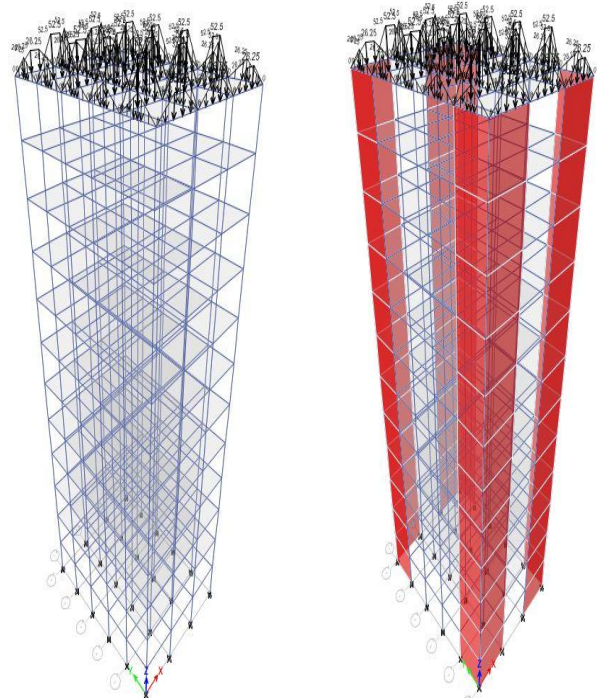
3d View Of Building With Heavy mass at 12th floor With And Without Shear Wall
